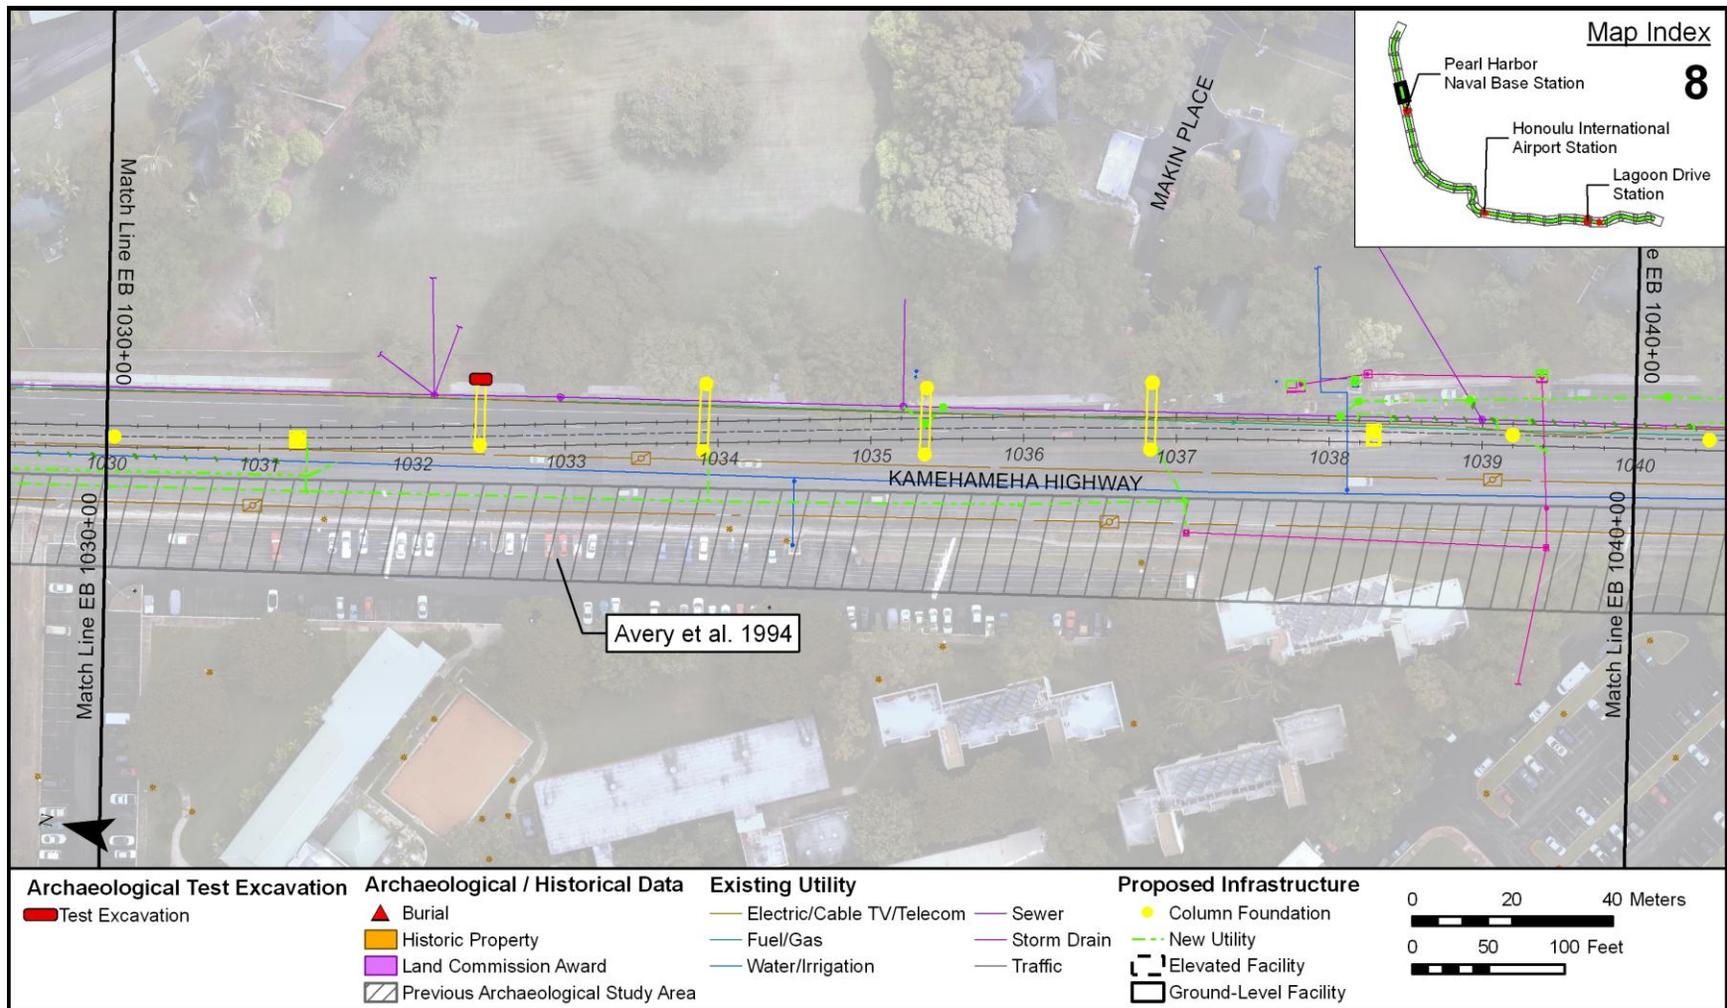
Map Sheet J 8, one 10x3 excavations at mauka Column foundation @ 1032+40
